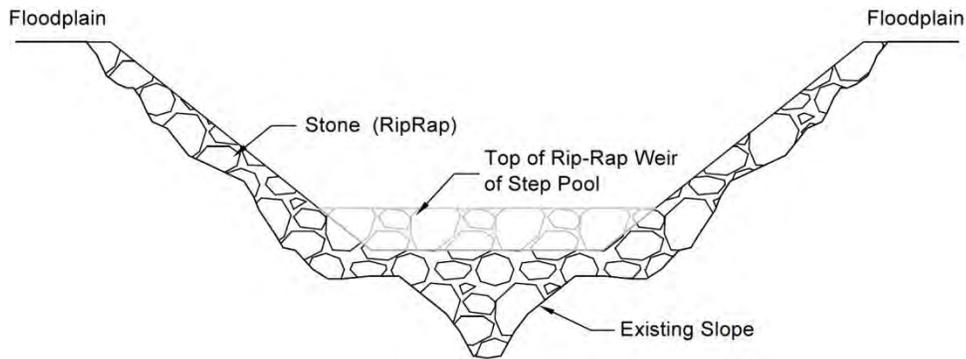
Step-Pool Cross-Section Concept Design (Not to Scale)
